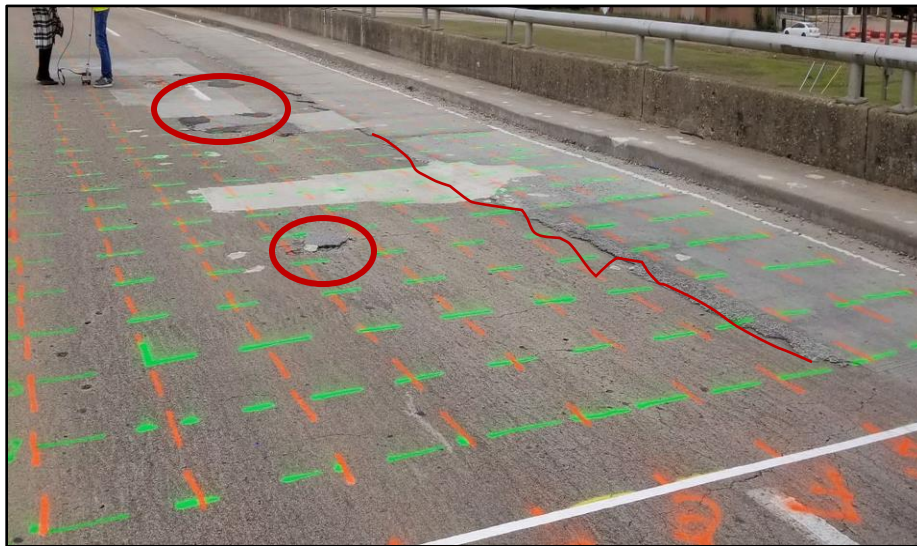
3 Cracks and repaired potholes on the bridge deck
